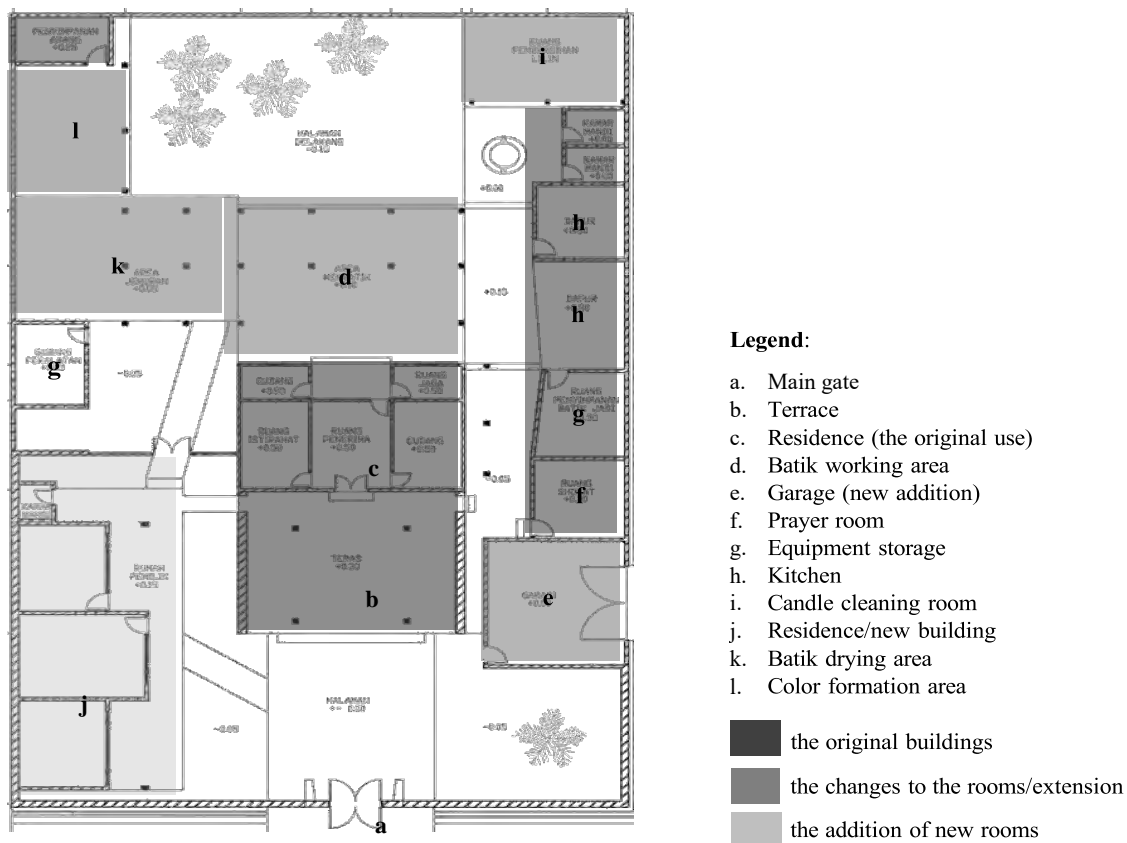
The floor plan showing changes of functions and forms at the Nyah Kiok House
